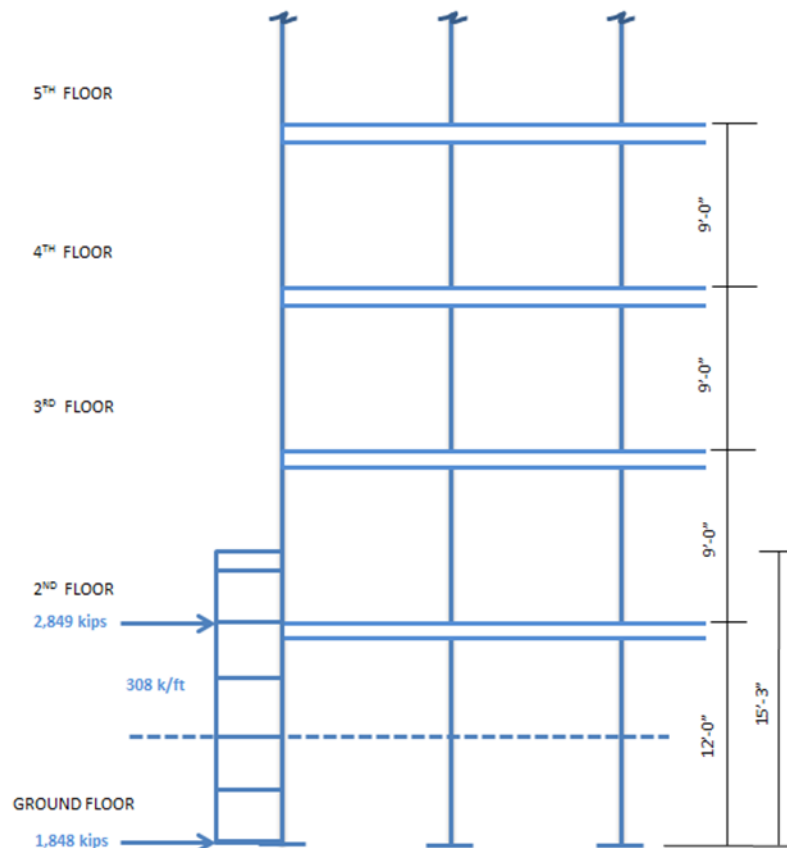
LC2 Tsunami loads on overall Waikiki Residential building
